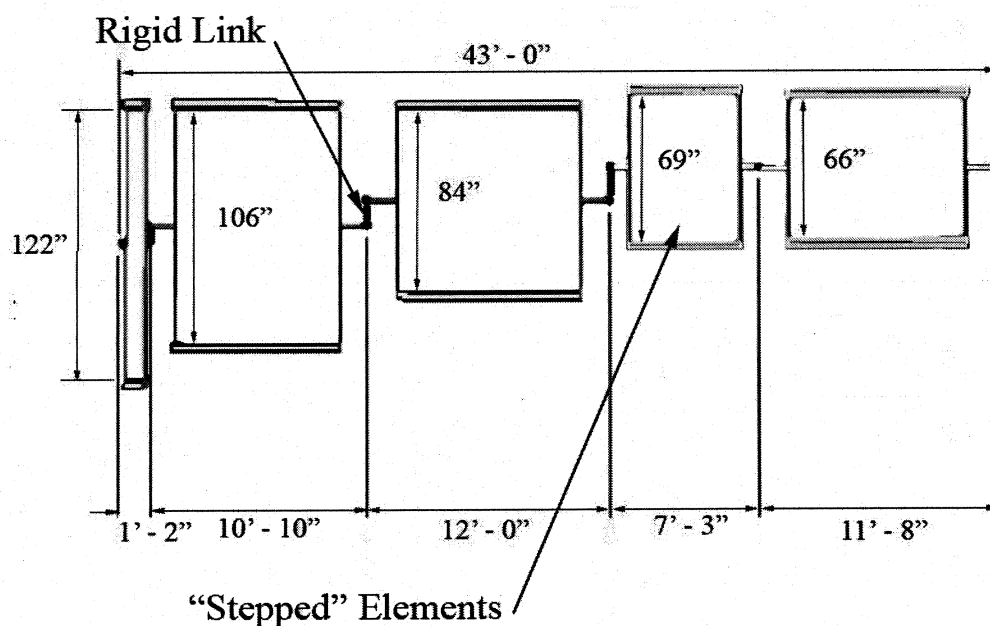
4: Stepped Element Model of Exterior South Approach Girder
